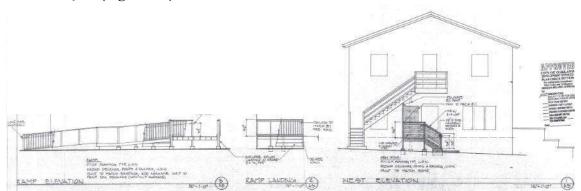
Drawings of ADA-compliant ramp and new stair to the first story entrance on the northwest façade. Source: "Lincoln Child Center, Crocker Building Modification," David Wade Byrens, Sheet A3, dated August 22, 1991.
